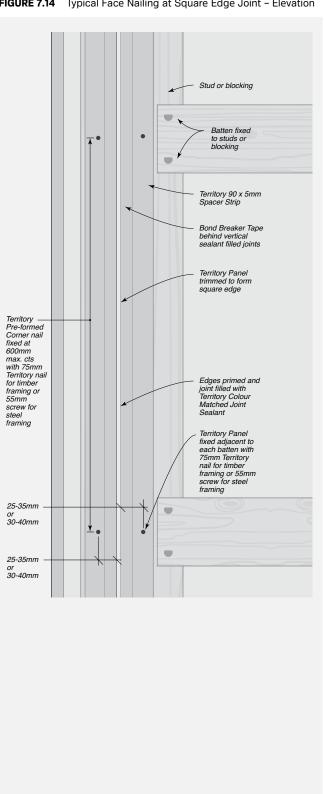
Typical Face Nailing at Square Edge Joint - Elevation
